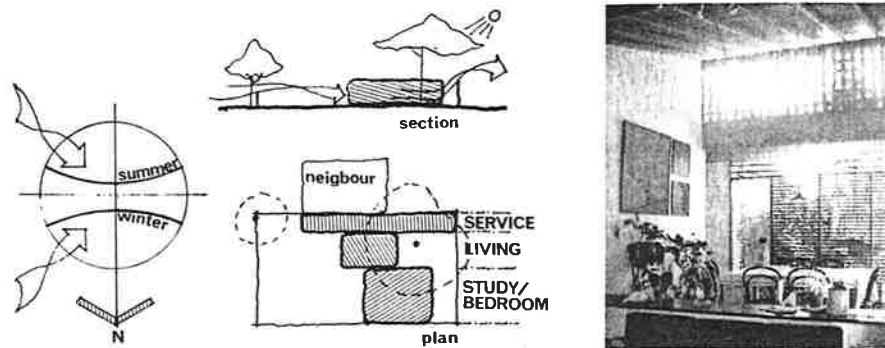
Site Layout (left) and interior view looking from the living room toward the courtyard (right).
